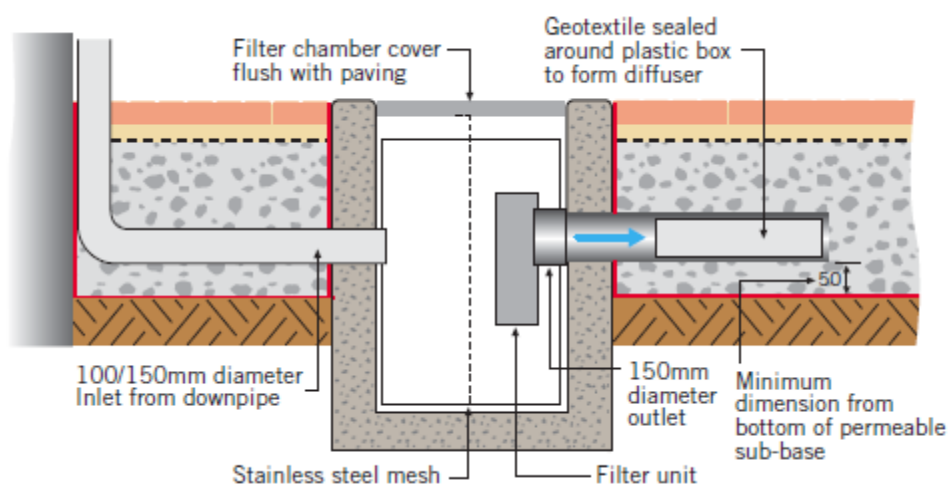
TYPICAL ROOF DRAINAGE OUTLET (INTERPAVE GUIDANCE DOCUMENT, 2008)
